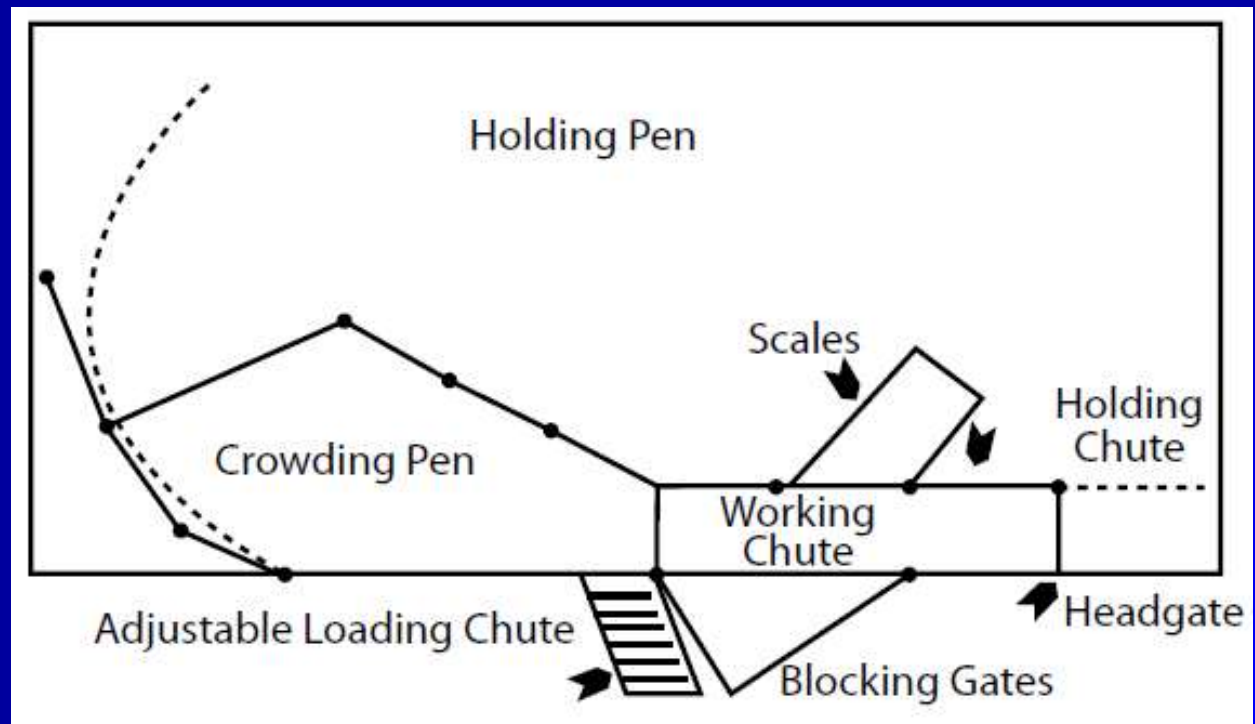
Sample Layout of Beef Cattle-Handling Facility.
